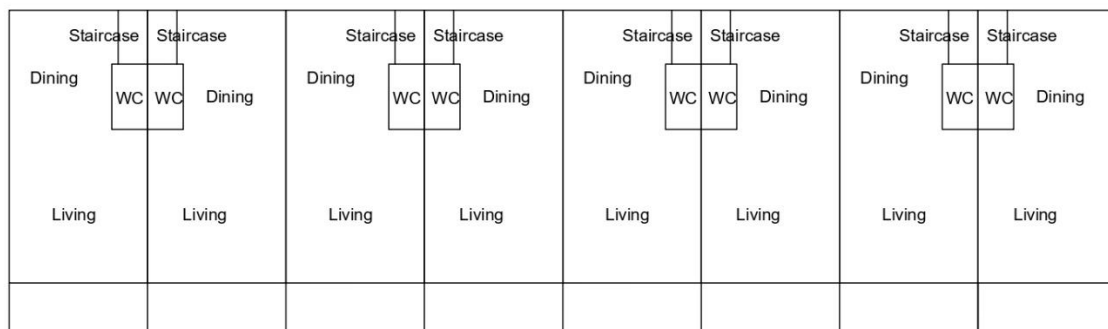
Ground Floor Plan: Affordable Housing Borey-Type
